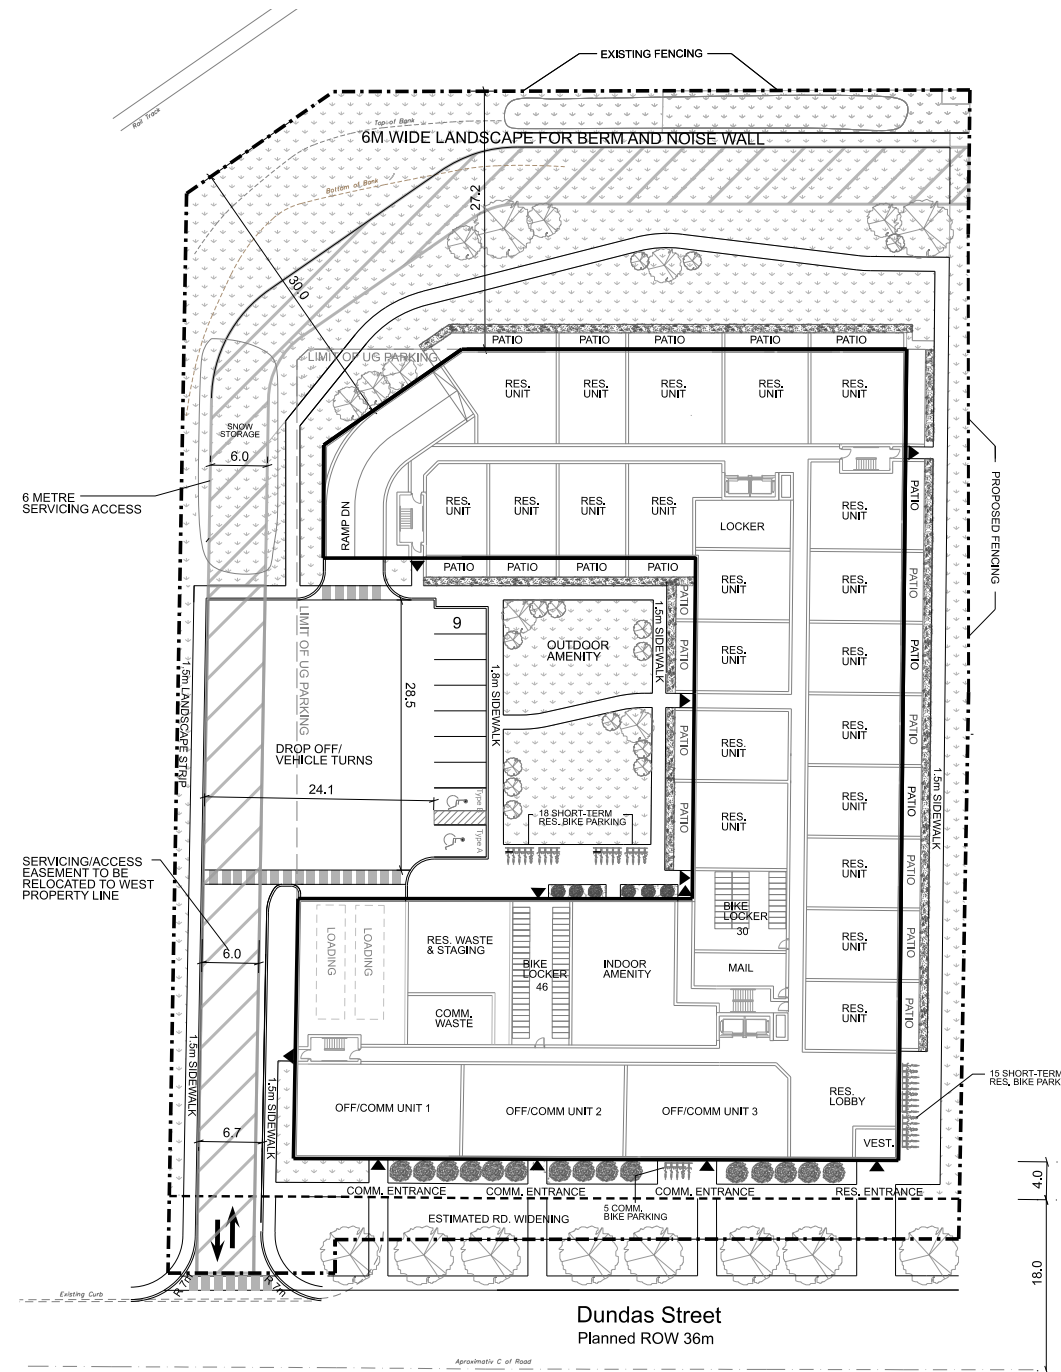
Ground Floor Plan Prepared by Weston Consulting
